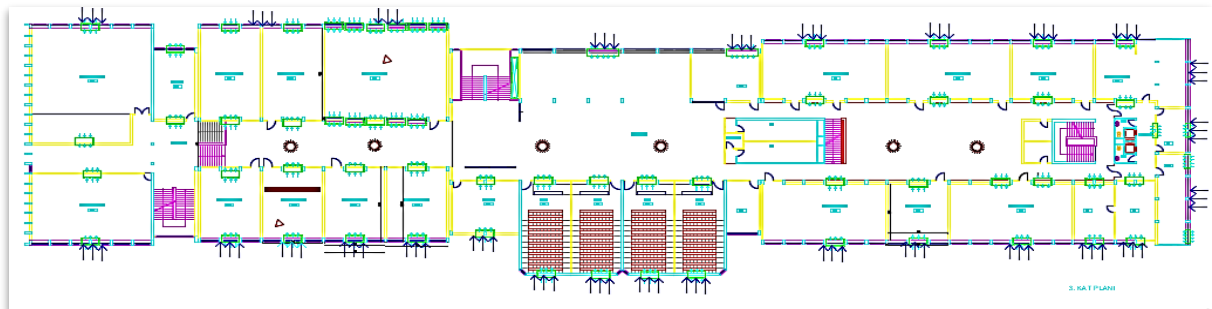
Plan layout of architectural floor chimneys and valves drawn in AutoCAD software (Tohidi, 2020).
